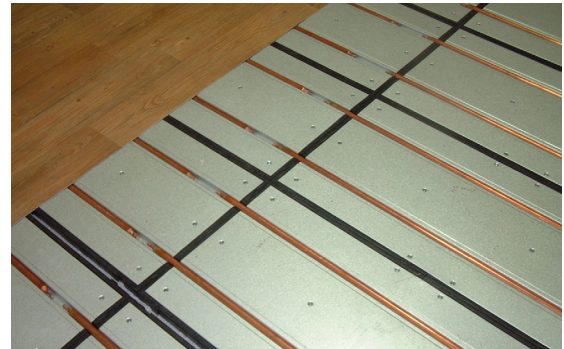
A picture of the radiant floor heating system with heat pipes.
